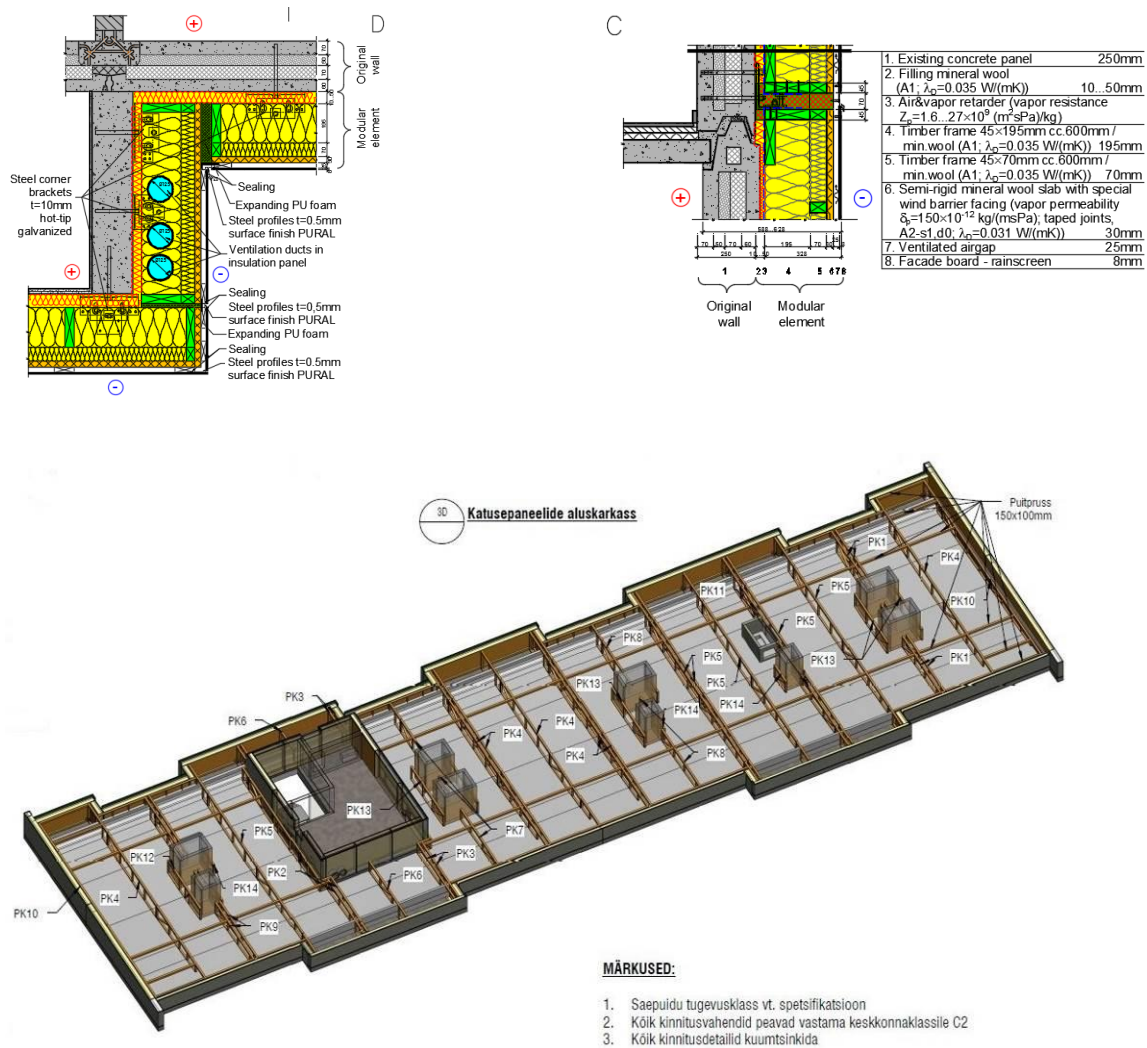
Designed solutions at the different structural points of Estonian pilot building wall modules (above and centre) and roof loadbearing structure (below)
